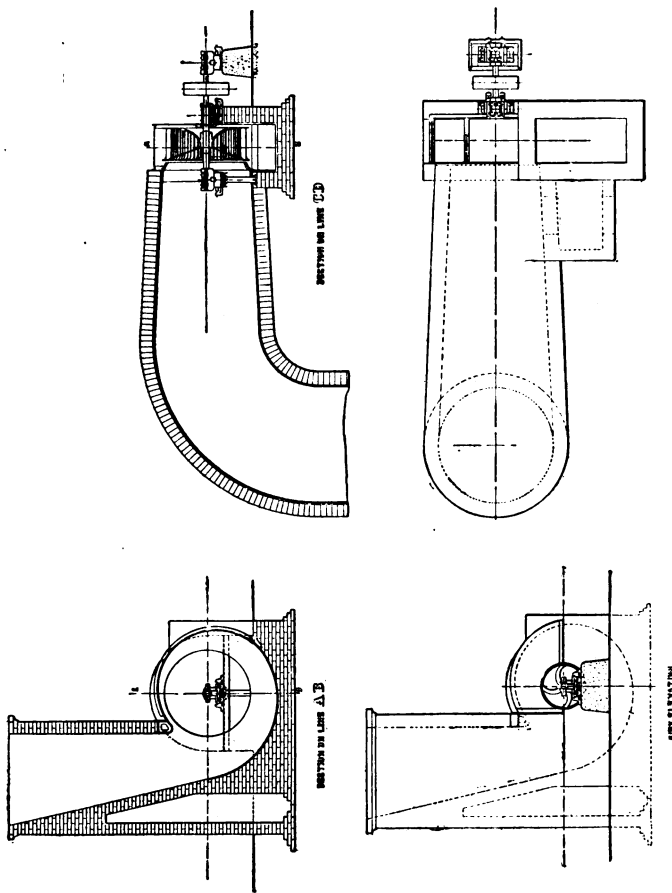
Arrangement of Sirocco Fan for Mine Ventilation : Single-inlet, Upcast Type.
